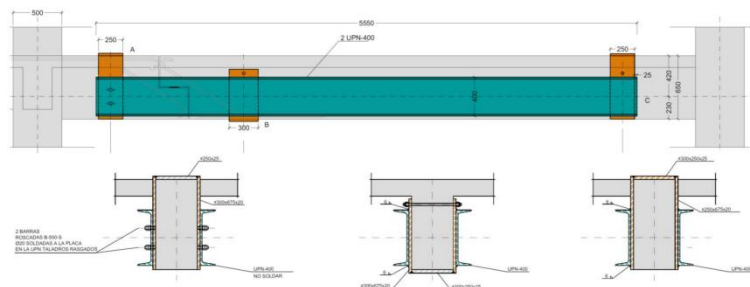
Typical steel reinforcement of a longitudinal beam at a joint section
